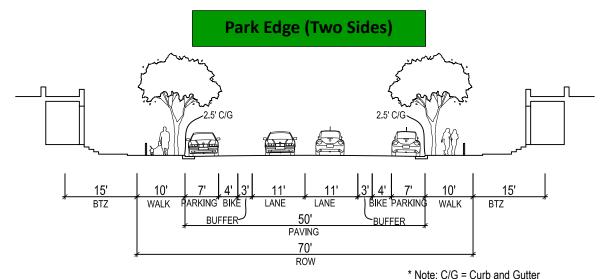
Street Type 4.2: Park Edge Double-Loaded Cross Section
